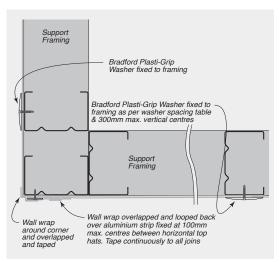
Internal Corner - Wall Wrap Continuous
